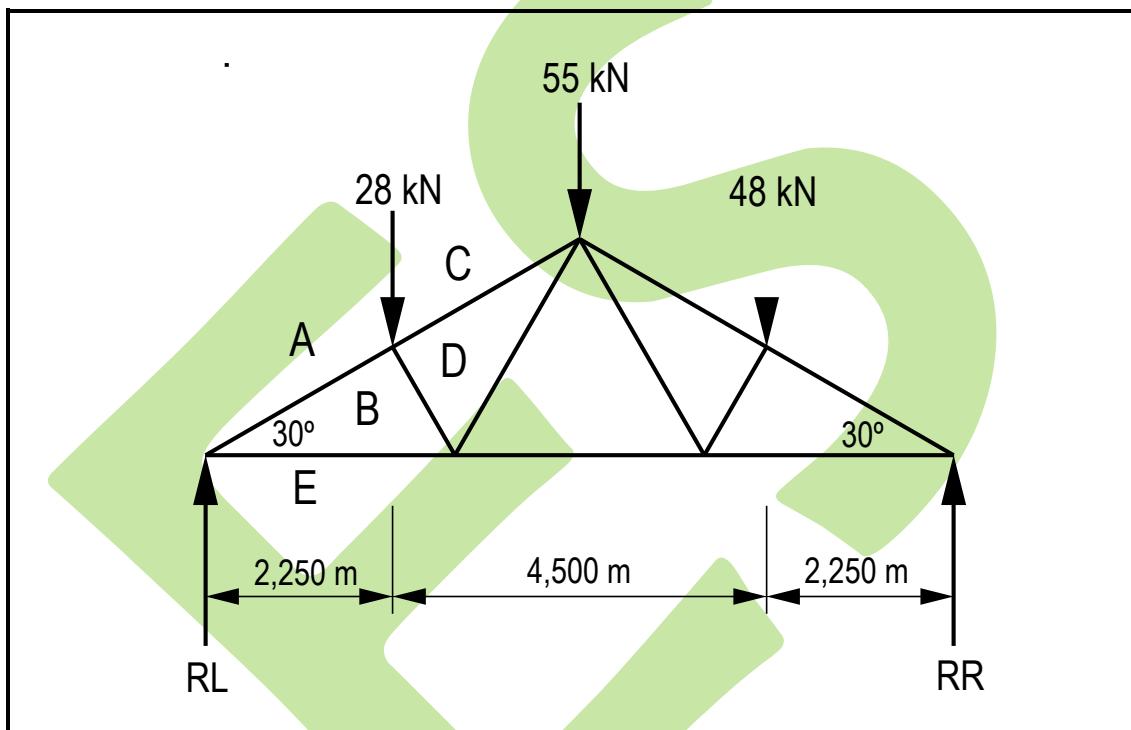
shows the front view of a loaded steel roof truss for a small motor garage workshop.
